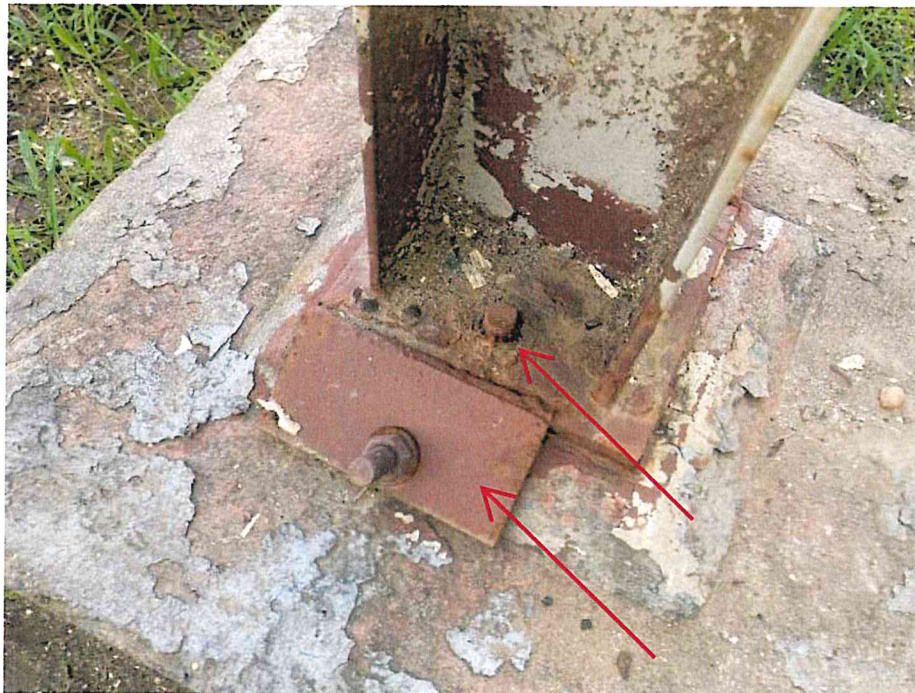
Close-up photo showing column base with retrofit base plate flanges and anchor bolts
